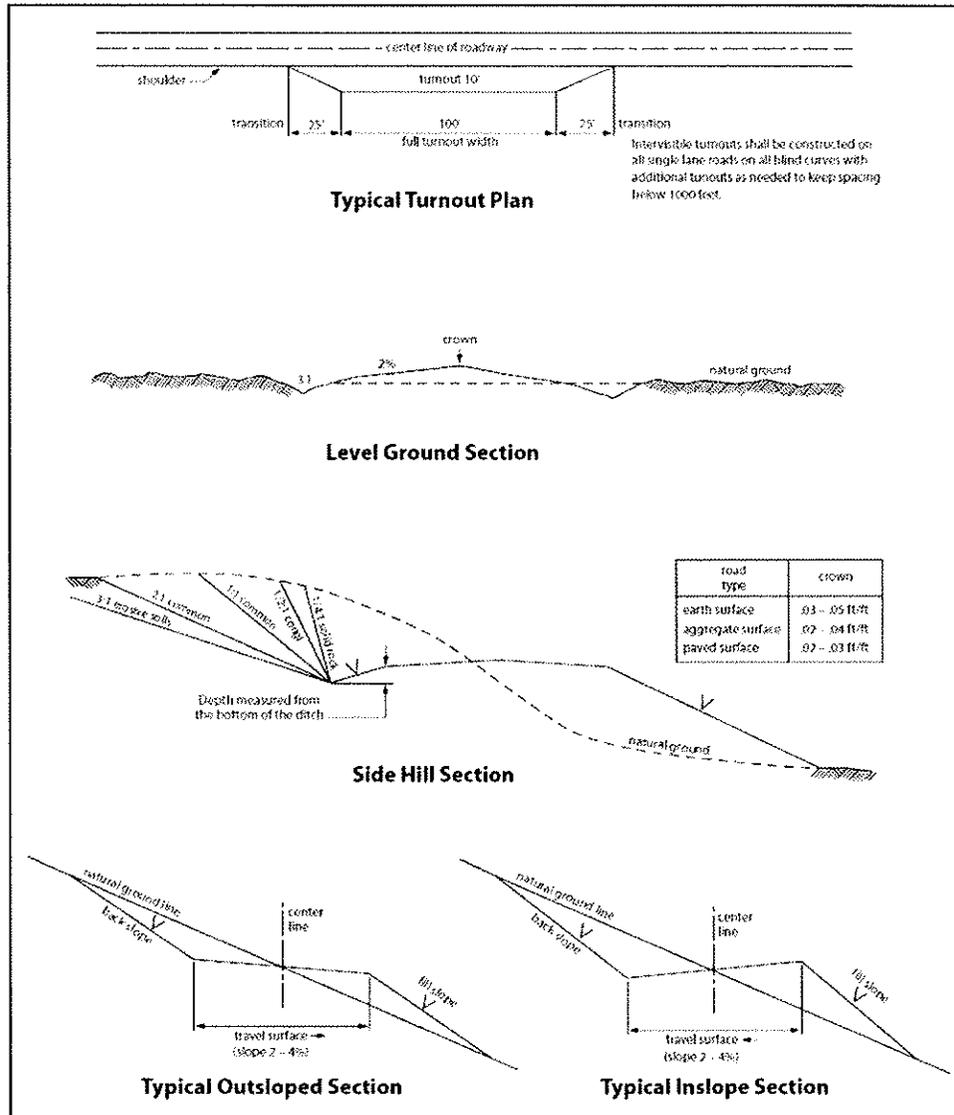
Typical road cross sections (BLM and USFS 2007).
